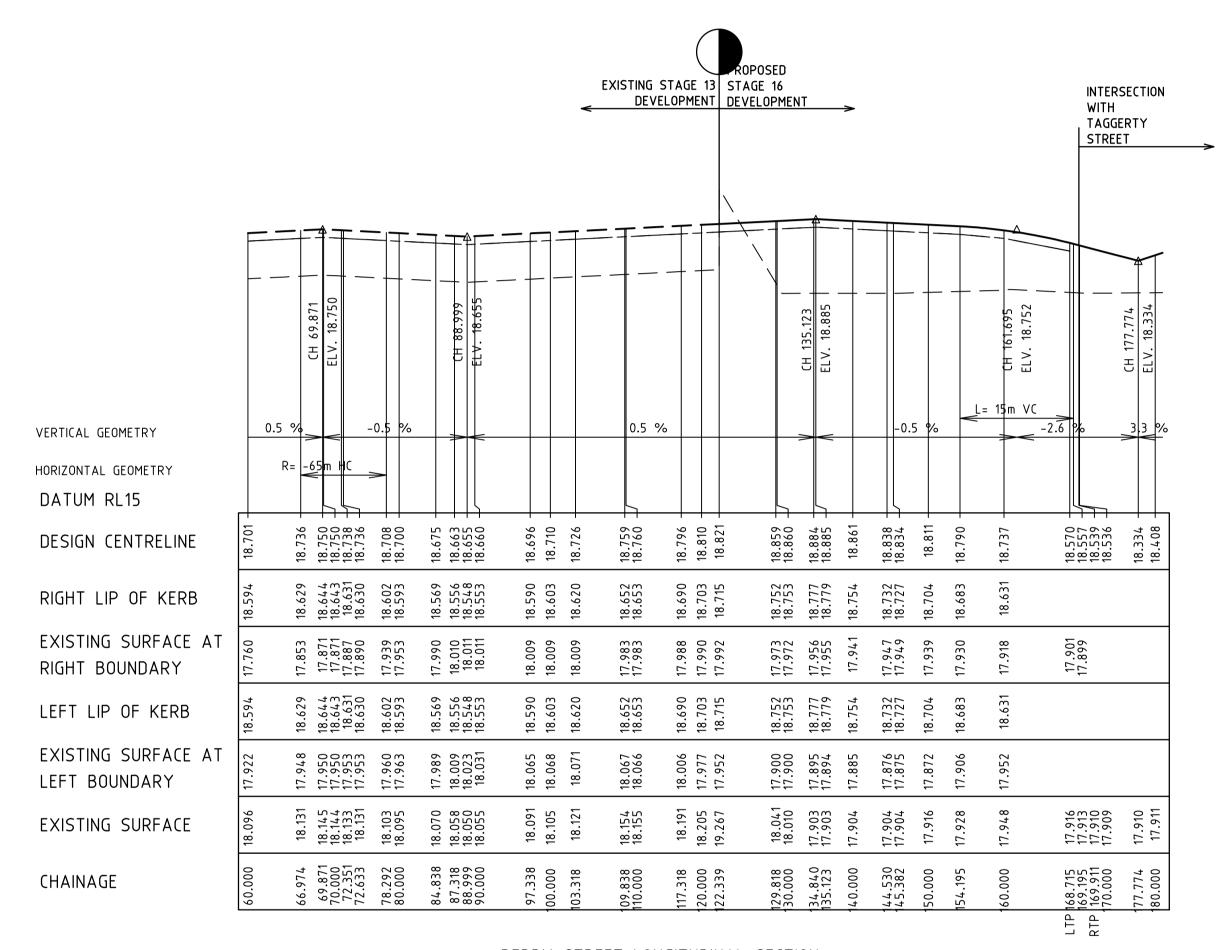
E-16-09 Sheet No. 9 of 33
